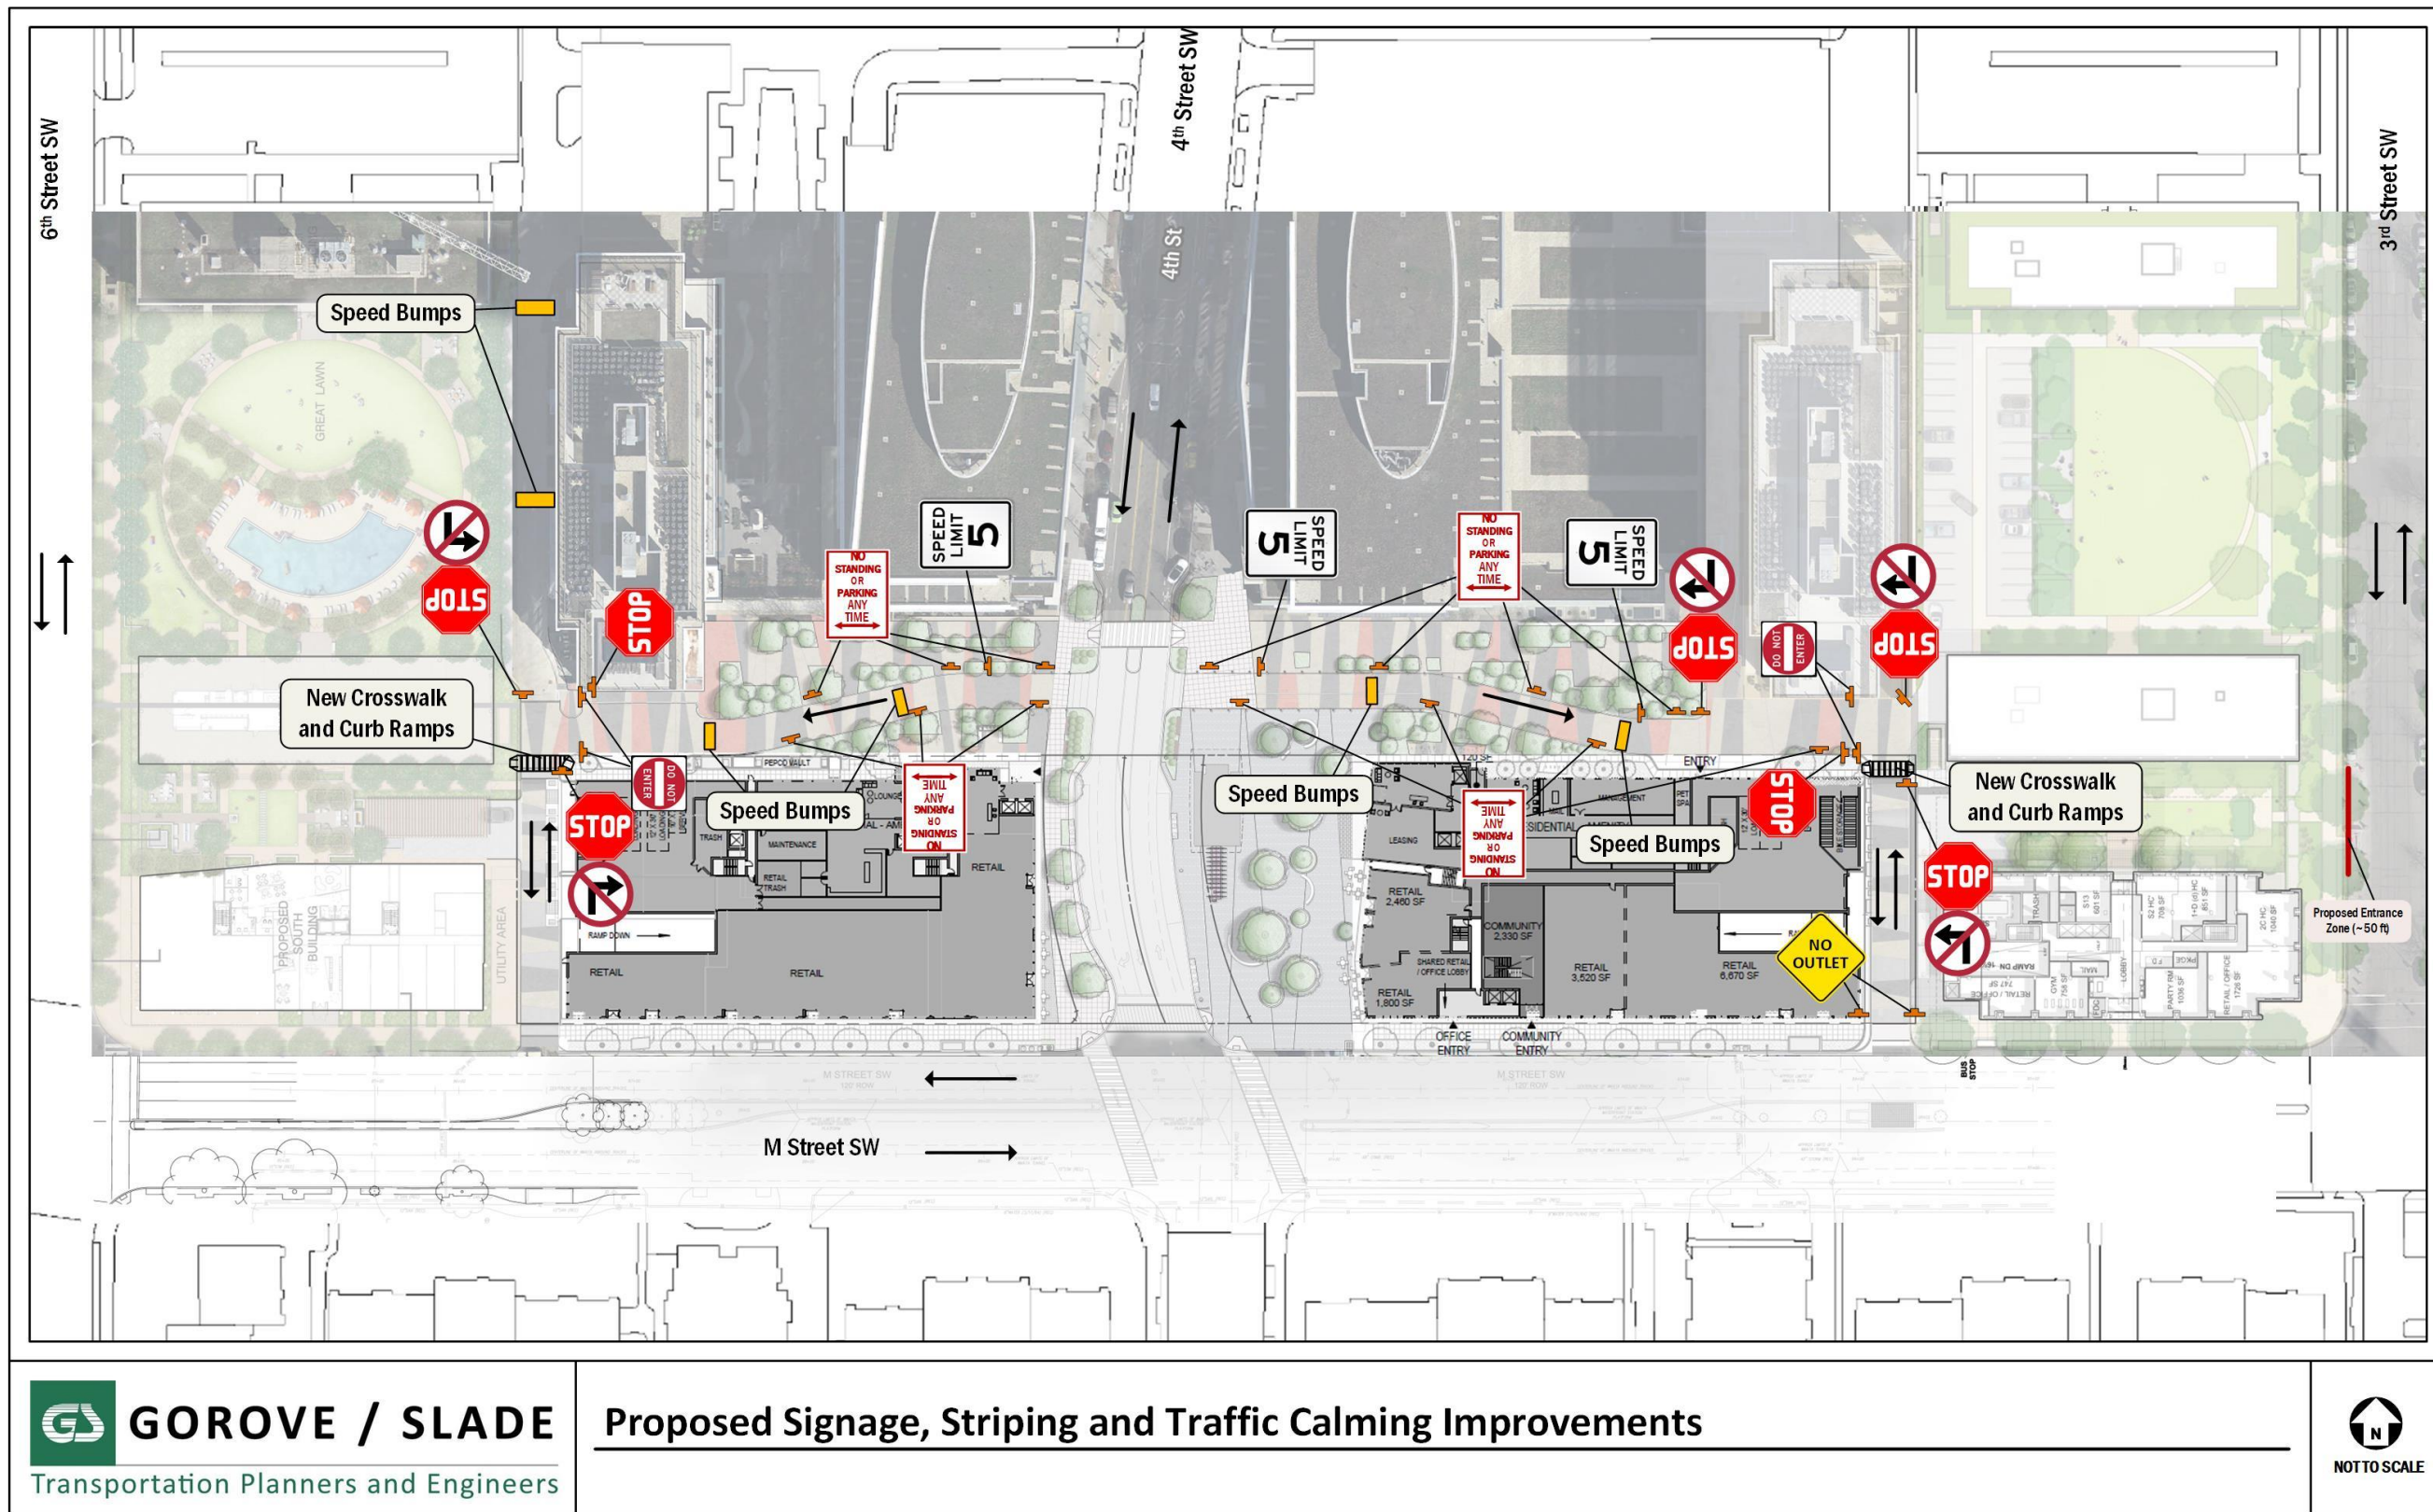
Proposed Signage, Striping and Traffic Calming Improvements
